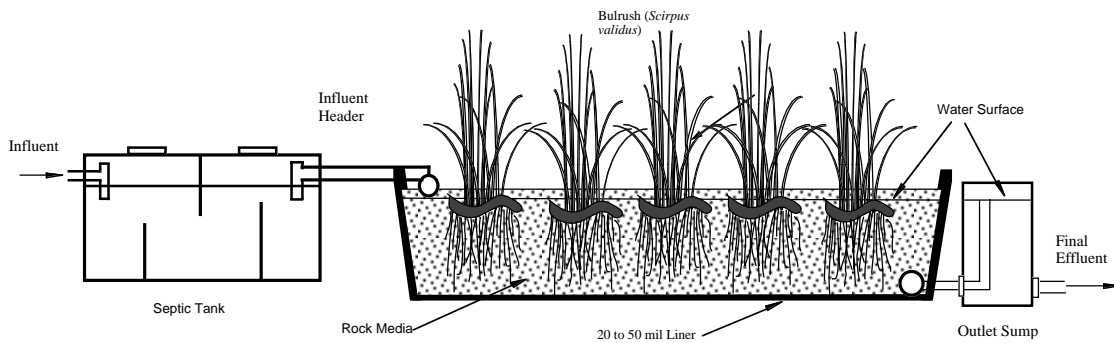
Typical Arrangement for an Onsite Submerged Surface Flow (SSF) Constructed Wetlands with Septic Tank Pretreatment.
